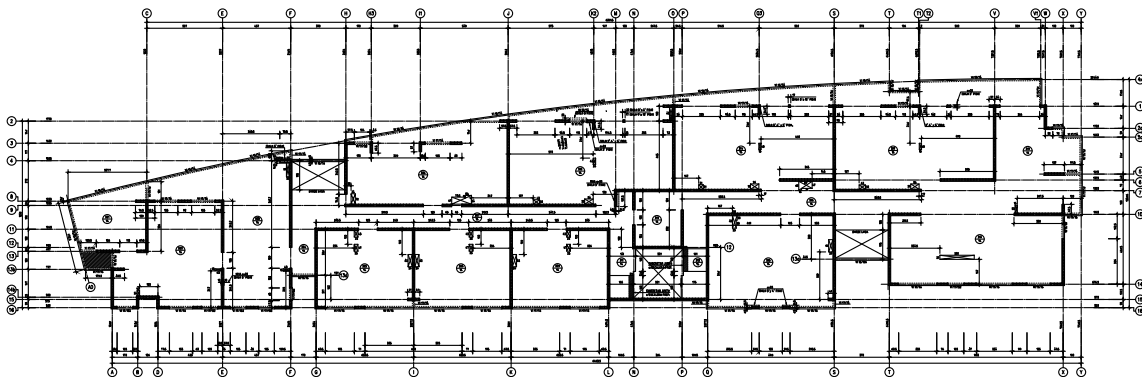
Emerald building (Santiago-Chile) – Typical plan view.
